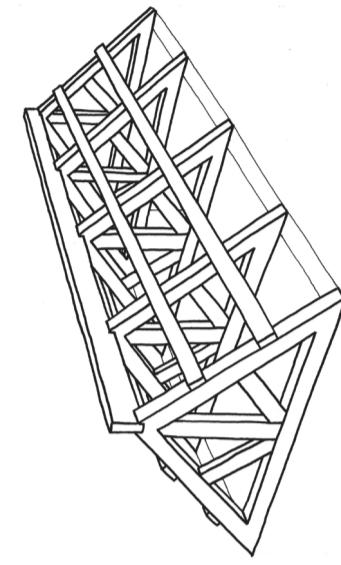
This roof frame is a frame structure made from wooden planks, a natural material. The planks support the roof.
